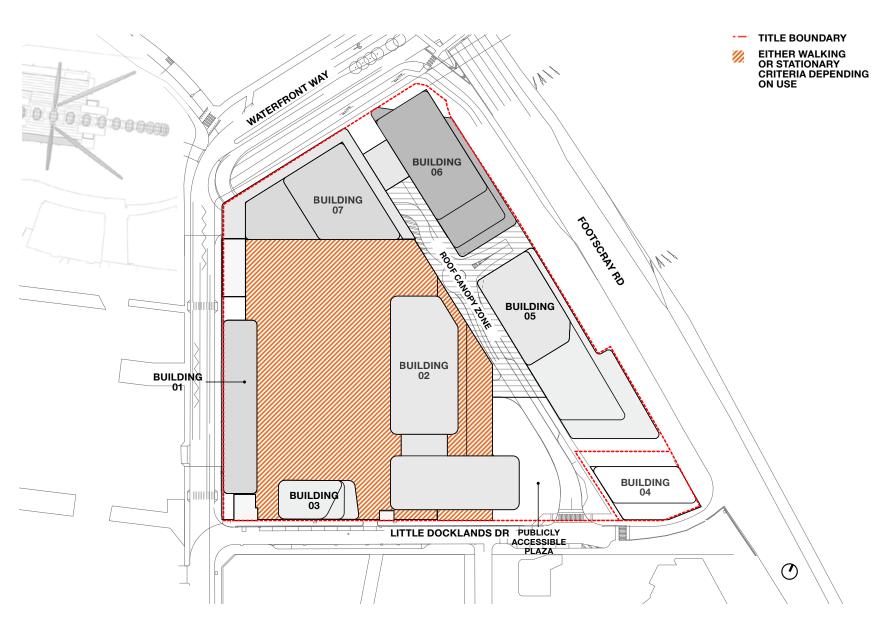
Concept Plan 9 - Wind standards, Elevated Communal Open Space
